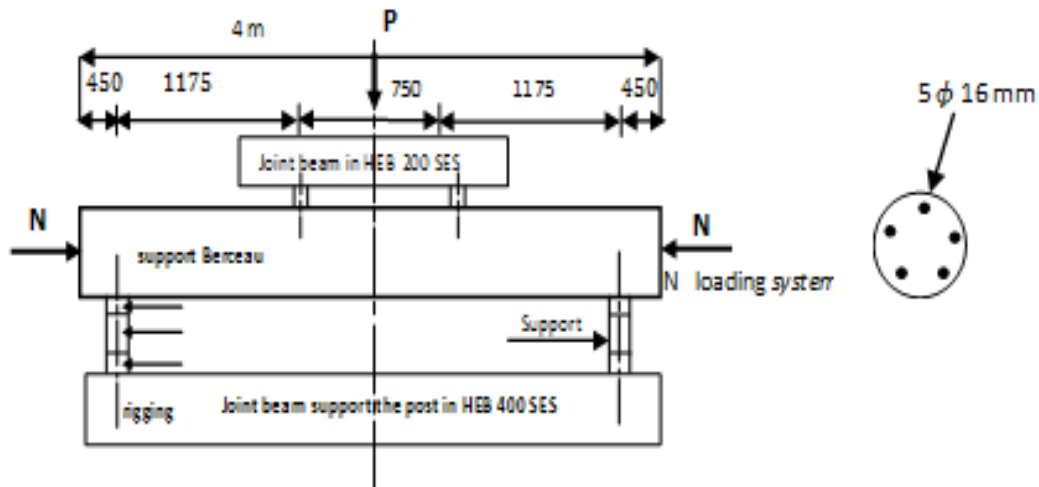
Combined bending test on a reinforced concrete pile with a circular cross-section
